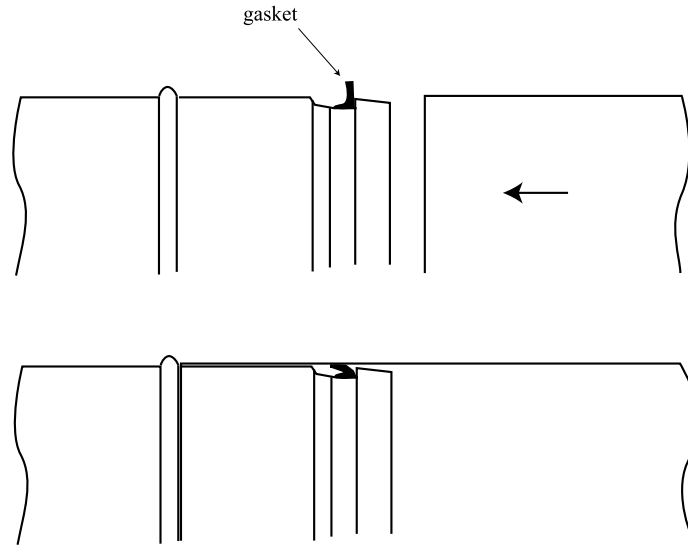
Pre-fitted sealing gaskets for circular ducts. Airtight rivets or plate-screws may be necessary to ensure the mechanical stability of the joint.
